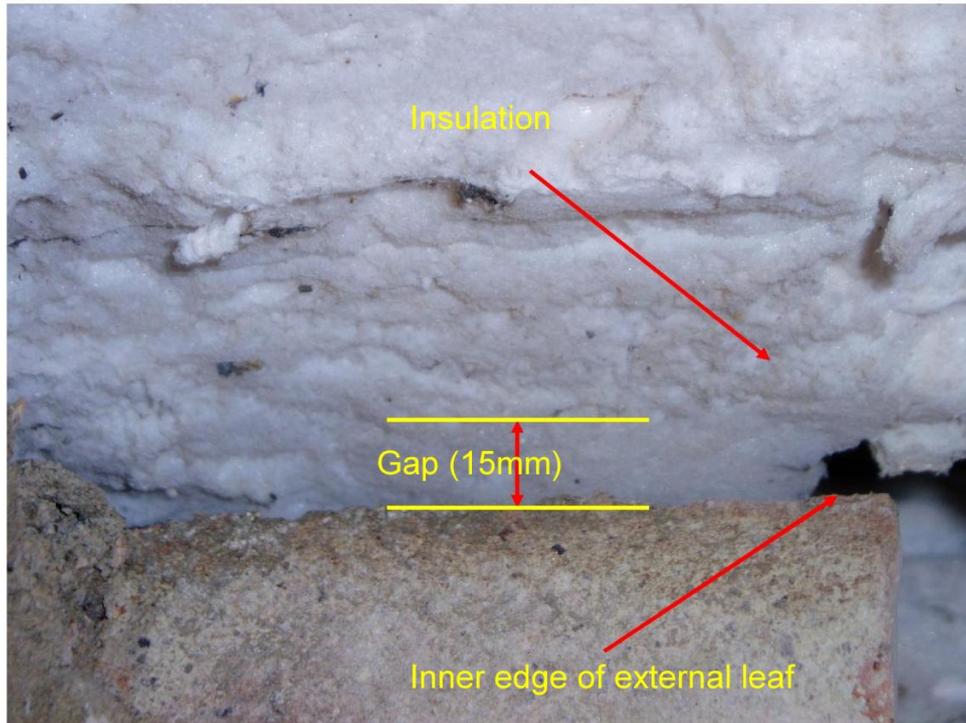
Gap between the inner edge of the outer wall leaf and the insulation.
